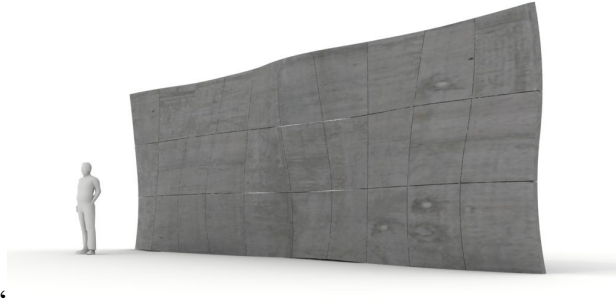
Computer rendering of a wall made up of elements produced with the double sided mould technique.
